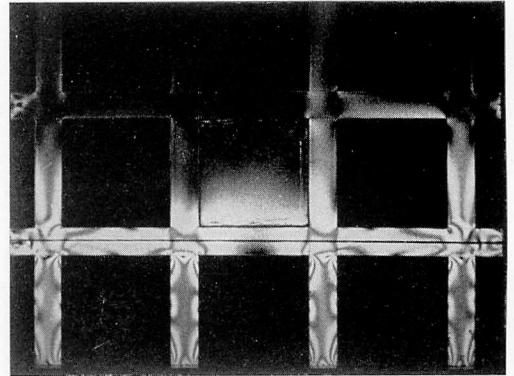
d Isochromatics of Frame with a Wall Panel Subjected to Lateral Forces on second Floor Beams
